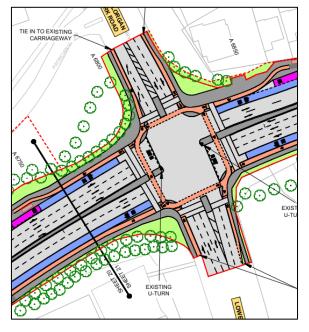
Extract from General Arrangement Drawings (Sheet 21)
